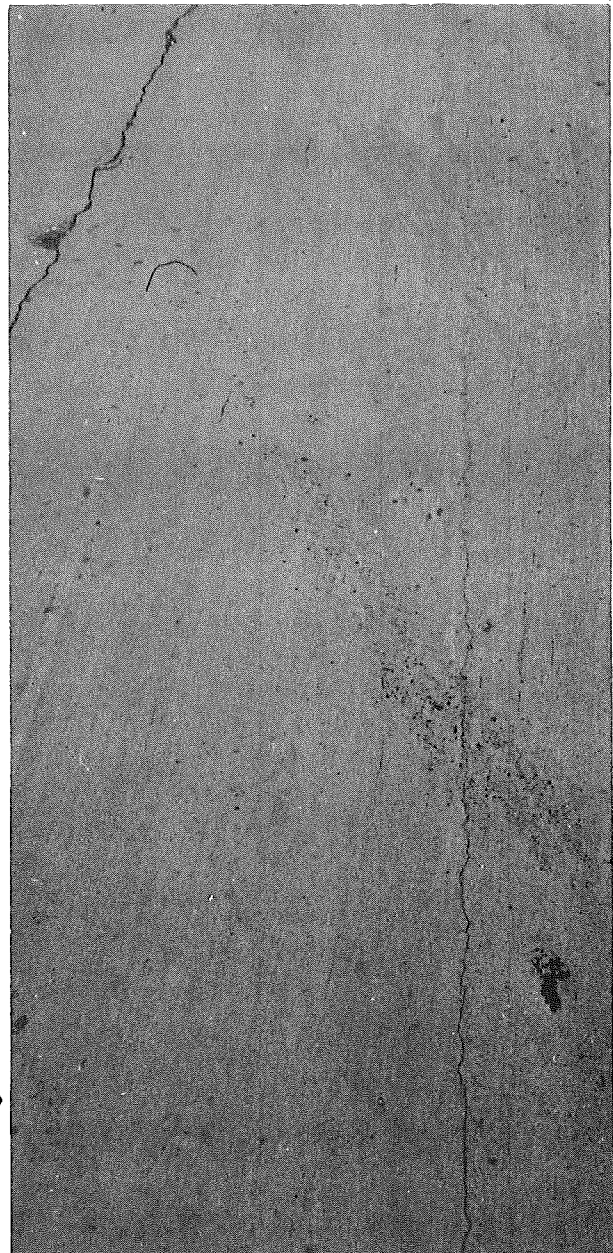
Random longitudinal crack (upper left corner) in standard pavement on Ill. 131. Note that the plastic strip failed to cause crack to form (upper center of photograph).
